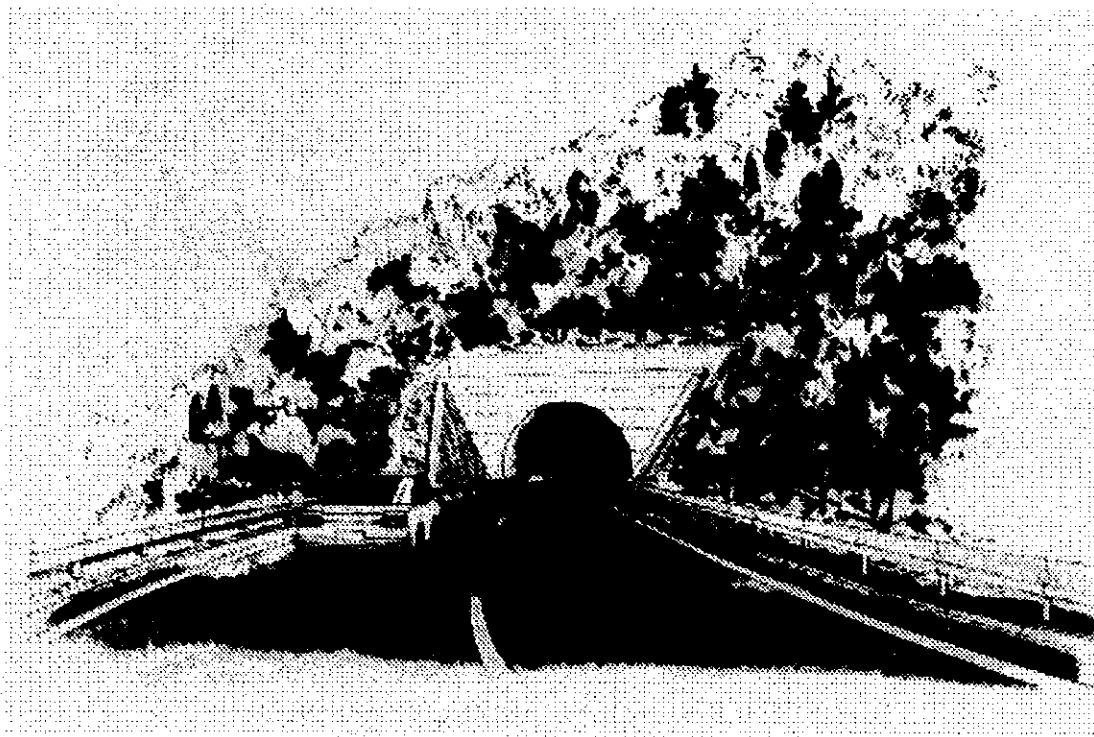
(a) WING WALL TYPE PORTAL
